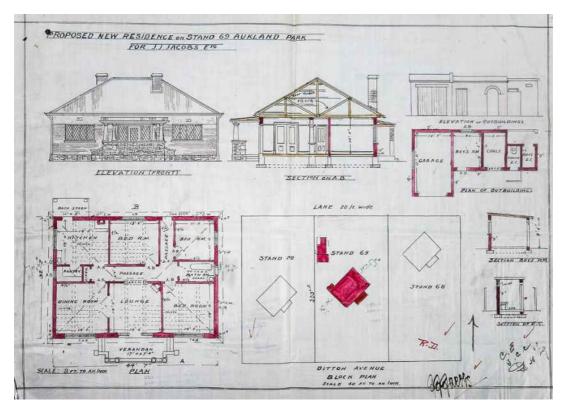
Original plan for proposed new residence on Stand 69 for J.J. Jacobs from 1929 (Source: City Council of Johannesburg, Plans Archive)
